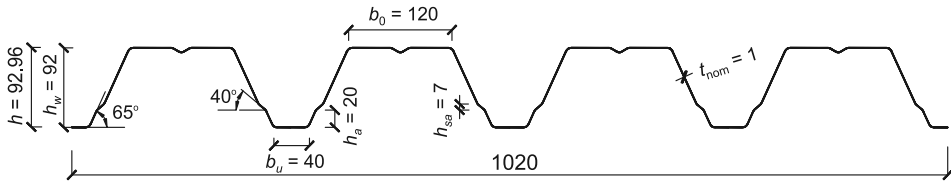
The cross-section of a 92 mm high trapezoidal sheet
